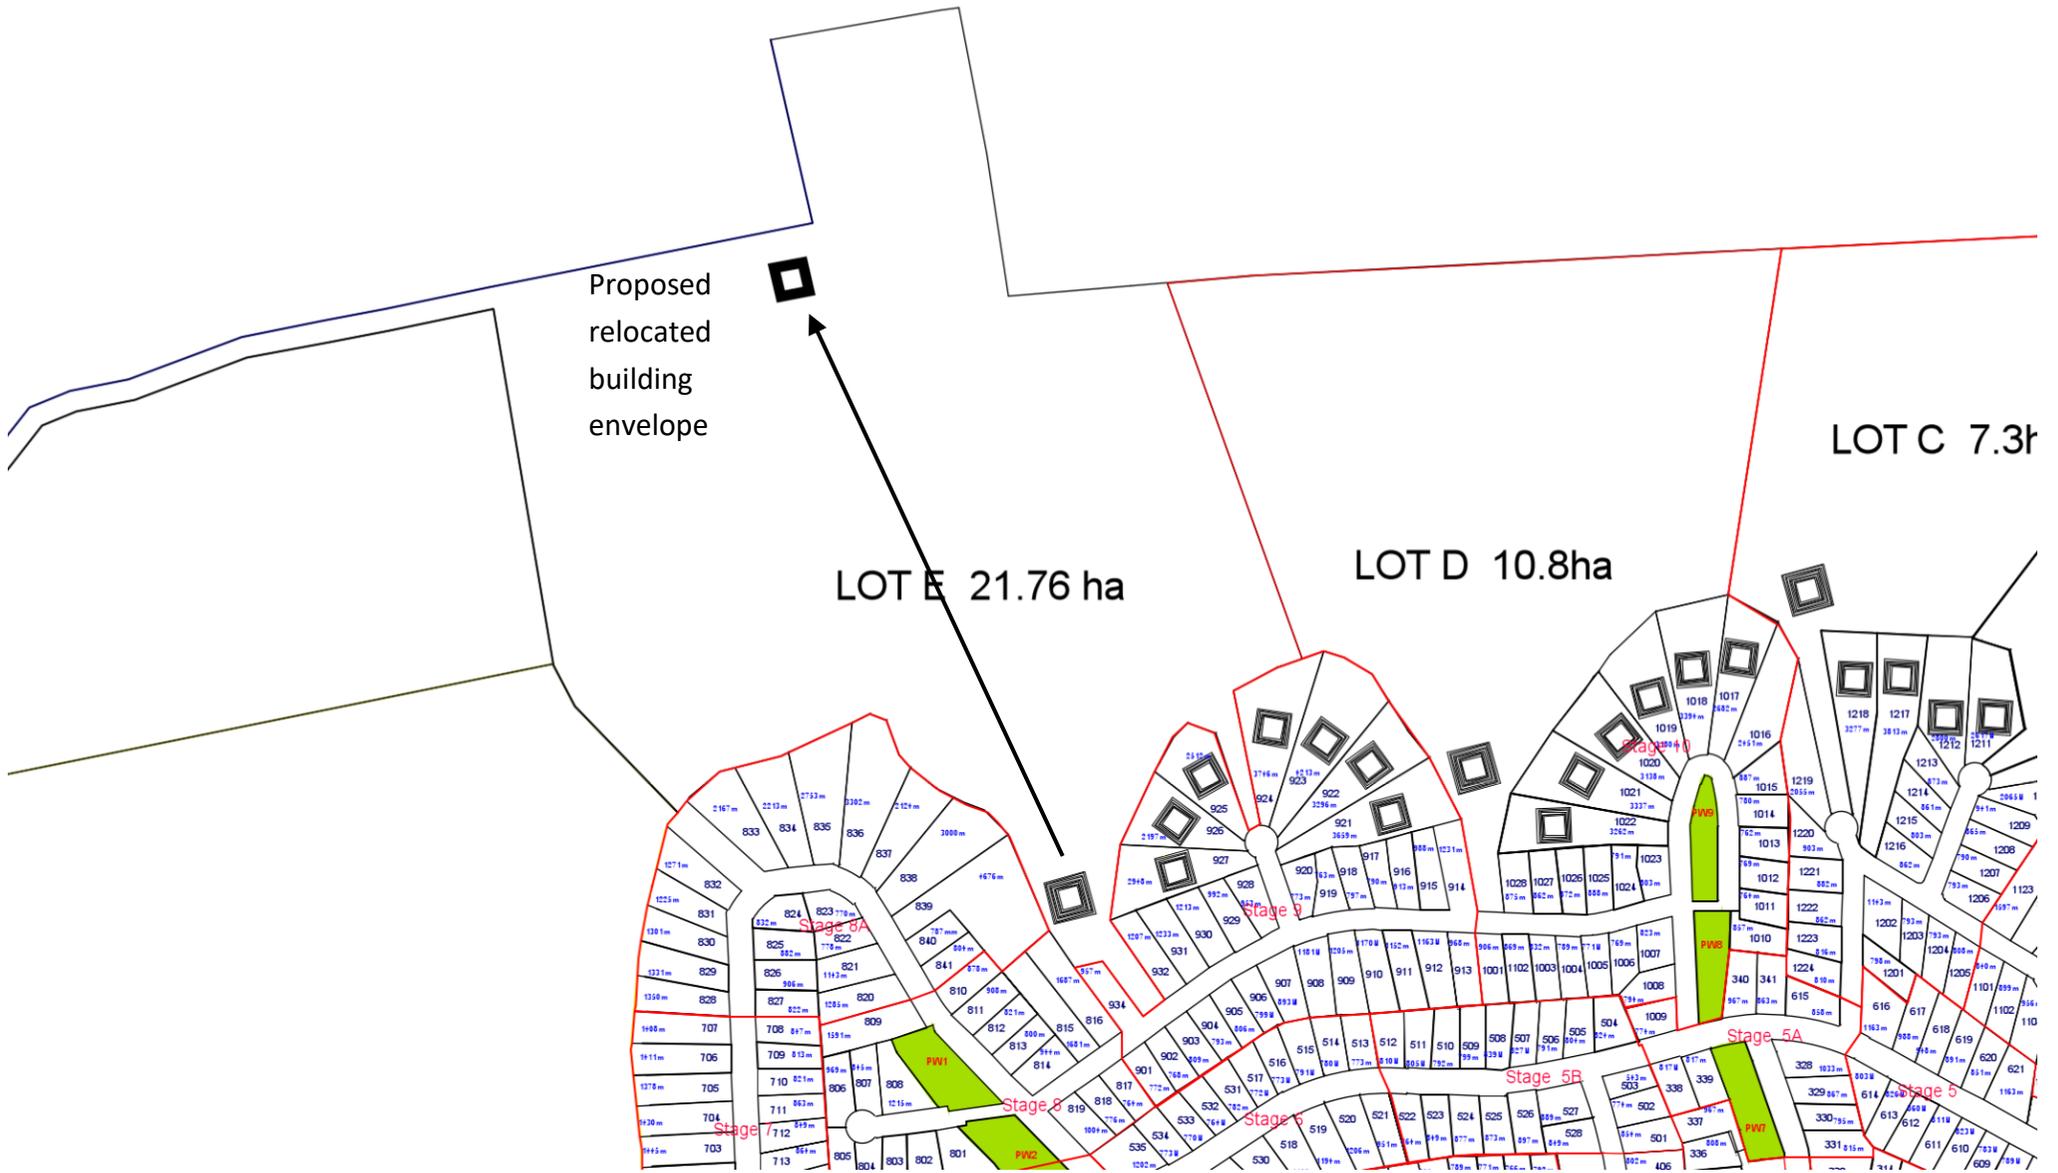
Master Plan Clarence Heights Specific Area Plan - Sheet 1
